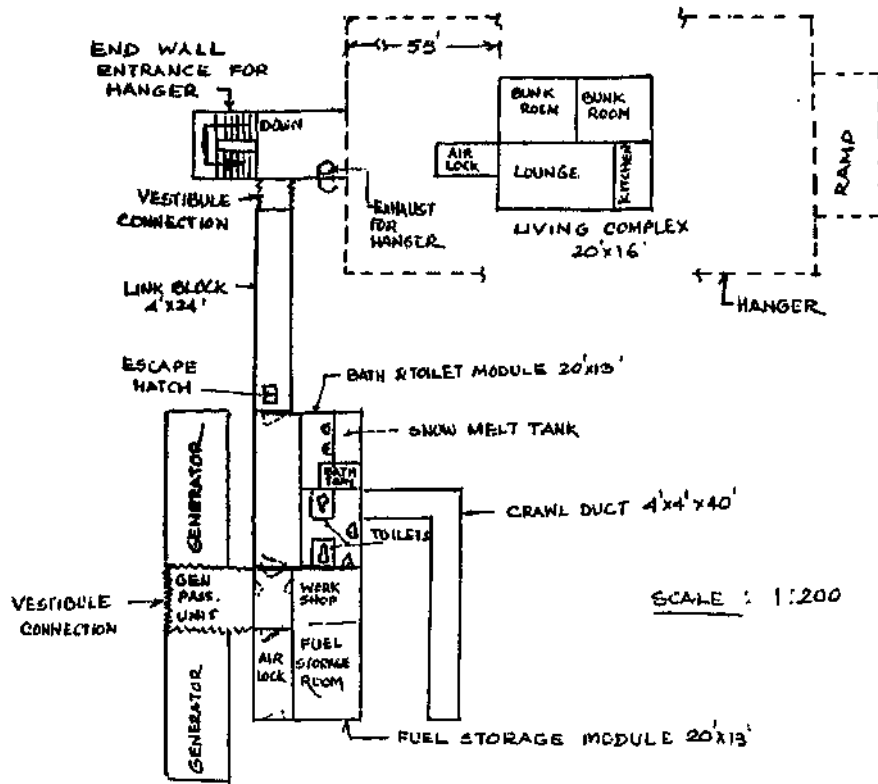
, Sketch showing planned layout of shelter accommodation in C&N Hangar, D.G.
